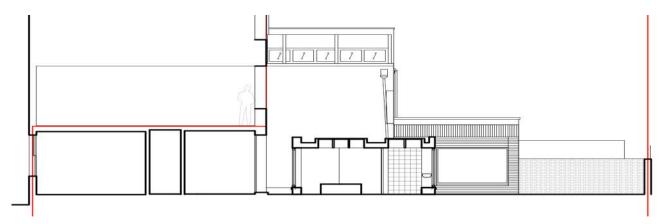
Section AA showing the overall sizing of the two component parts of the proposed extension building.
